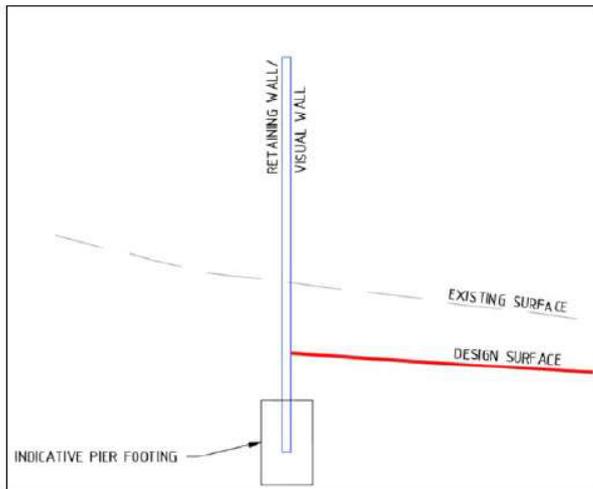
Exhibited Cross Section of Visual Wall – Bushfire Assessment
